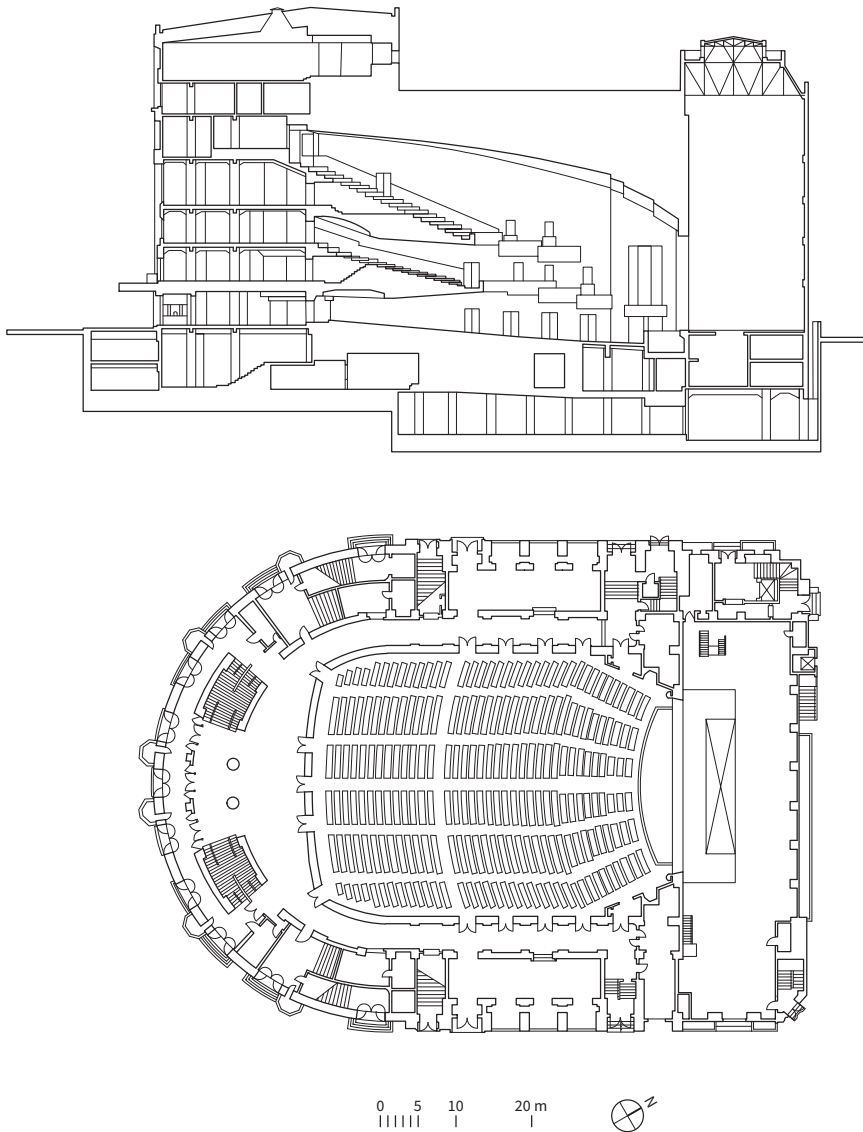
Longitudinal section (top) and floor plan (bottom) of the Nippon Gekijō, Scale = 1:1000.
